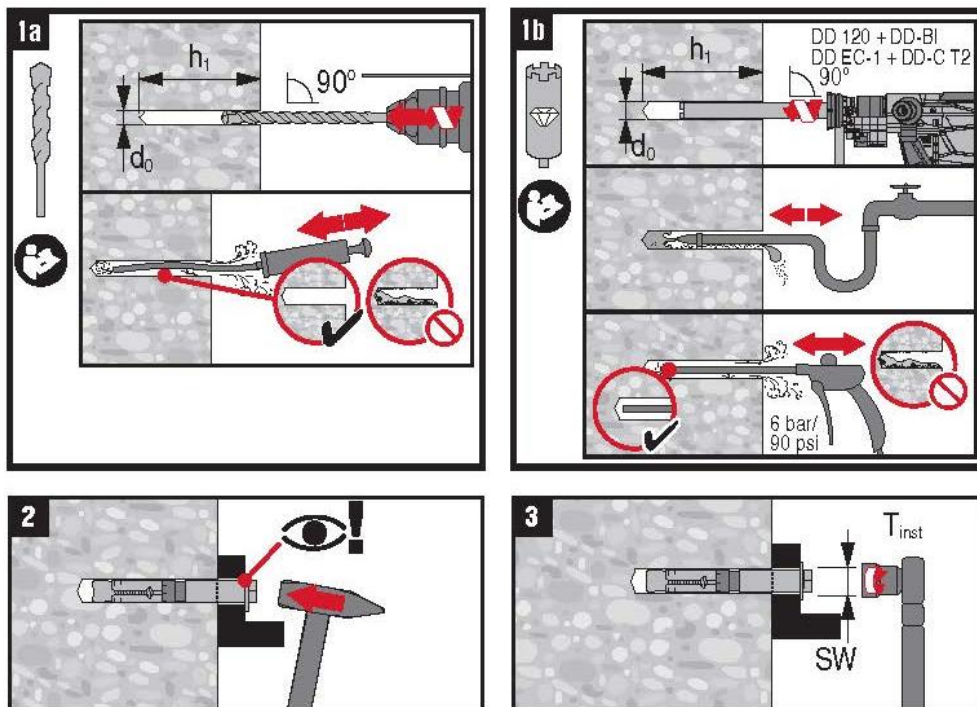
FIGURE B—MANUFACTURERS PRINTED INSTALLATION INSTRUCTIONS
